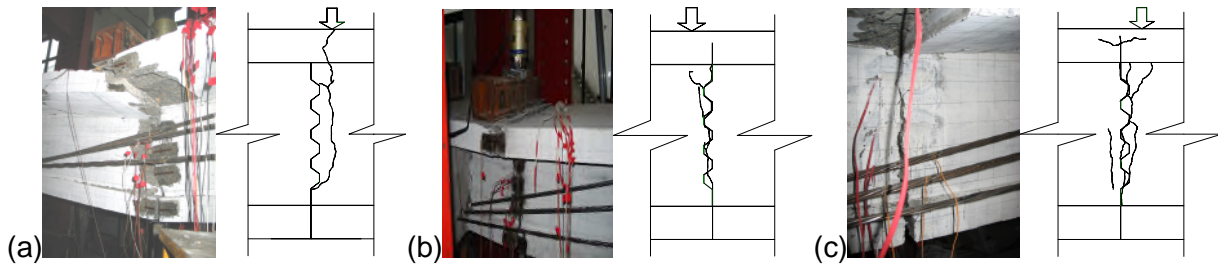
Actual failure modes and cracking sketches of dry joints: (a) SD-2; (b) SD-3; (c) SD-4
